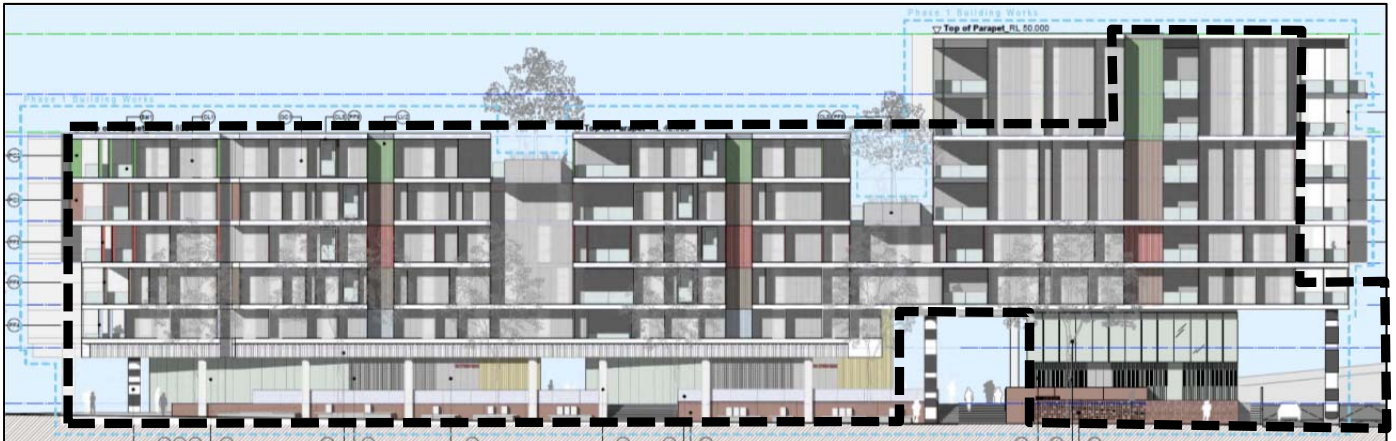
Overlay of approved Stage 1 building envelope on Building A
